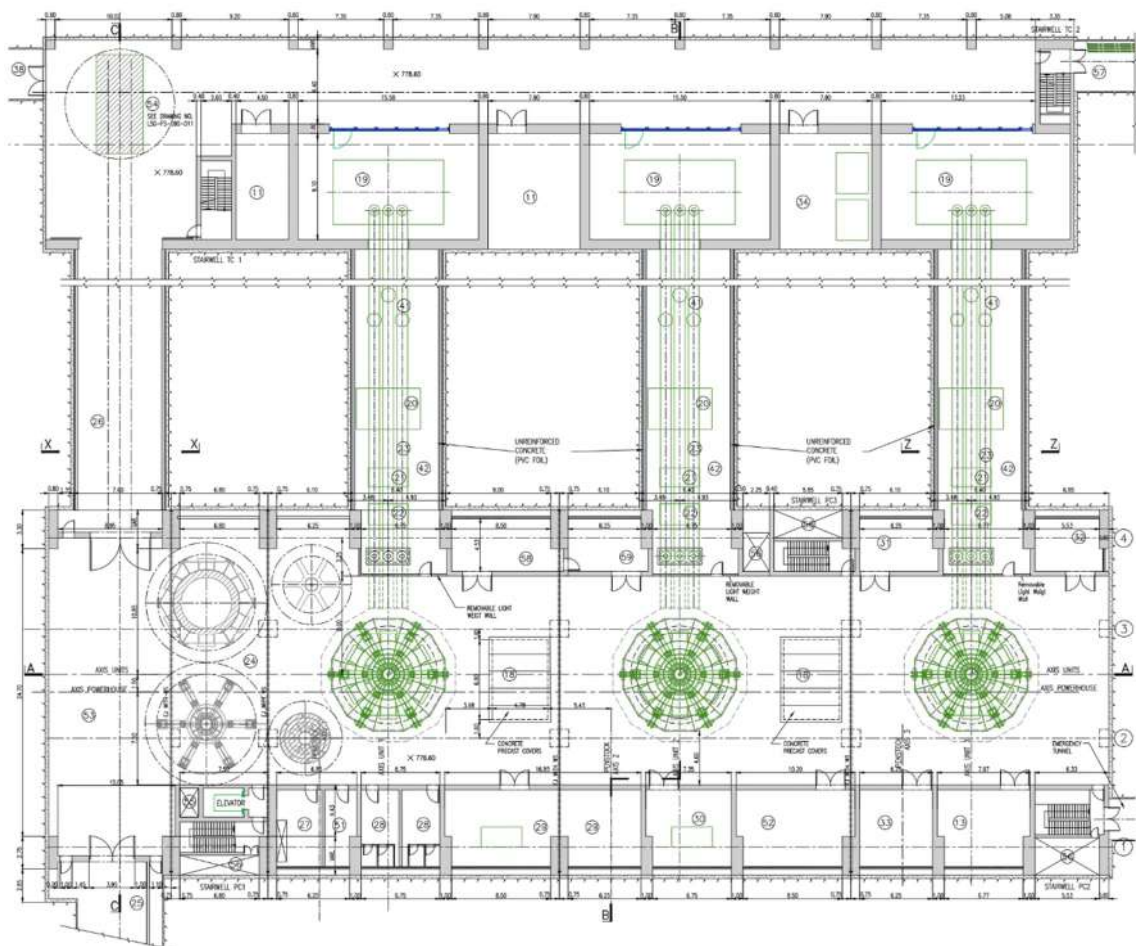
Machine hall floor - plan view at elevation 778.60 m asl
